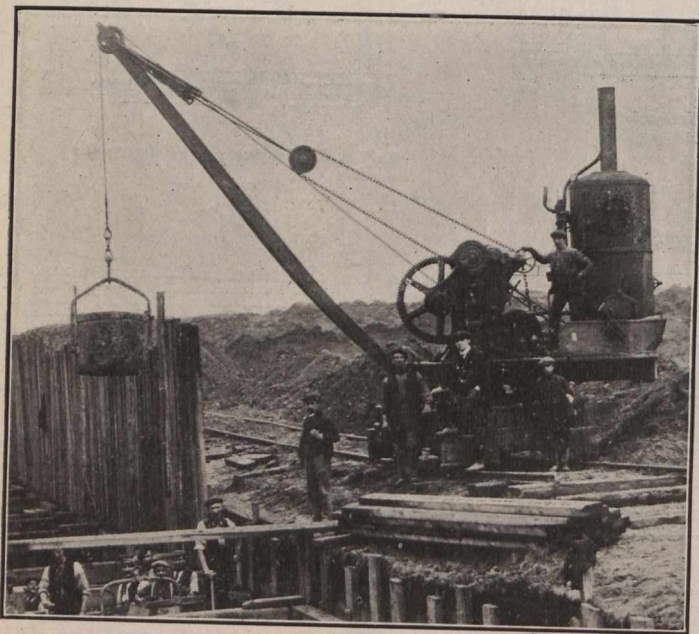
Trench Excavation Method, Delph Reservoir.
